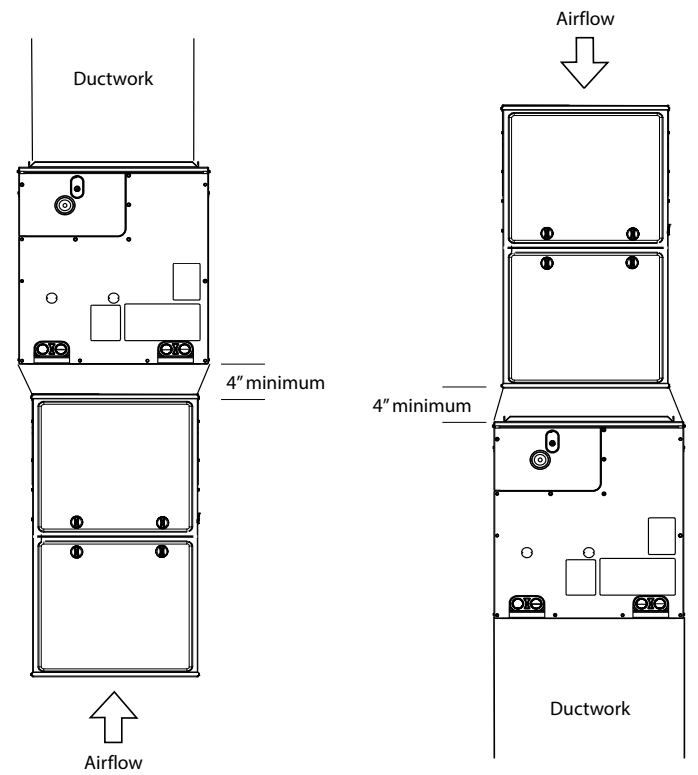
Adapter(s) Installation When Coil is Larger than Furnace
